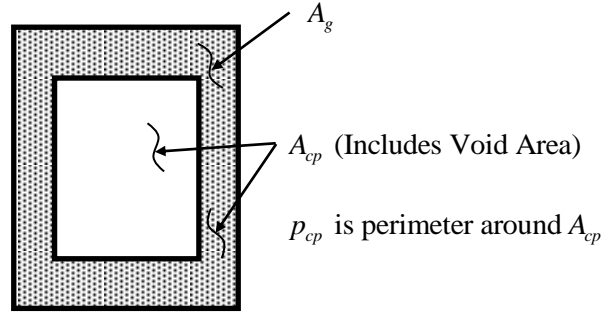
Sectional details for the calculation of cracking stress of concrete
